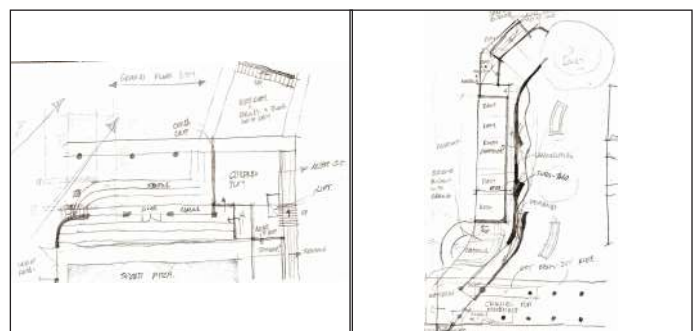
Plan exploration of the space under the gym and accommodation and public circulation (Author: 2019)
